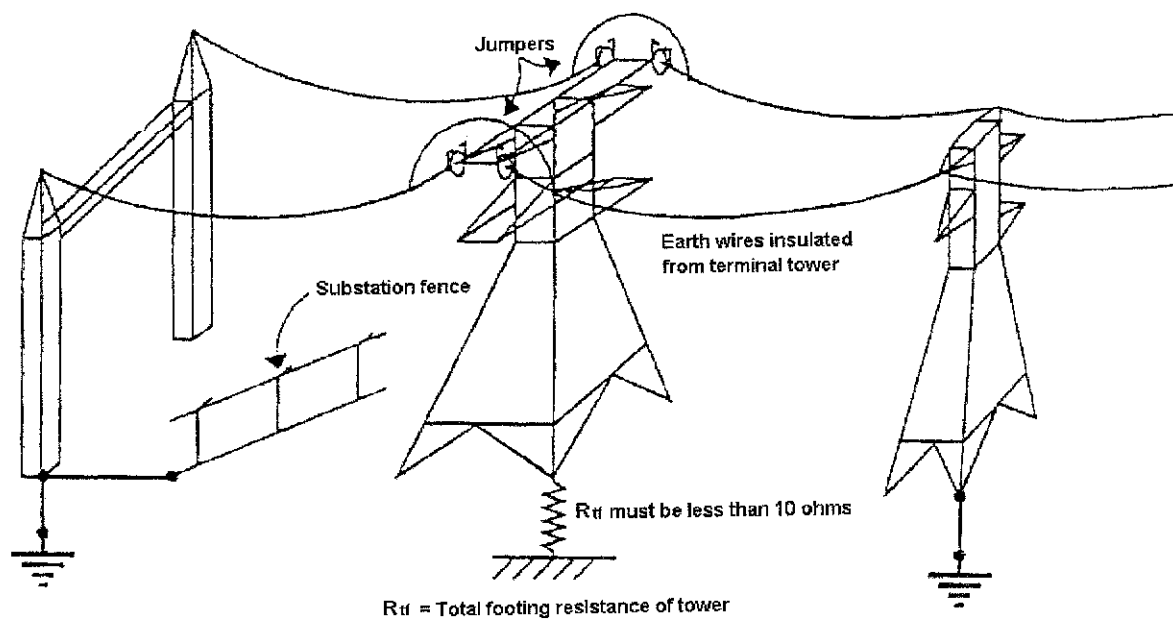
Insulation of earth conductors where terminal tower cannot be connected to substation main earth
